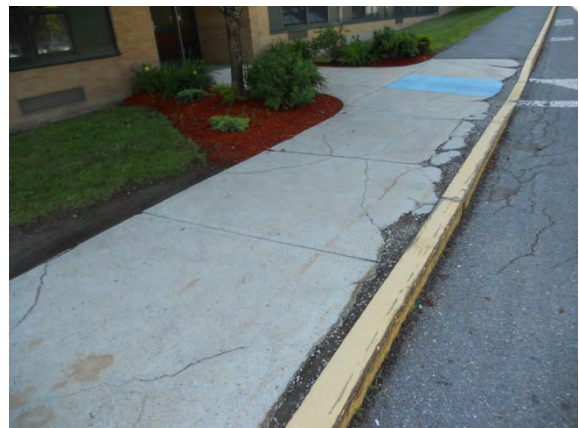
Cracked and deteriorated sidewalk along west side of building
